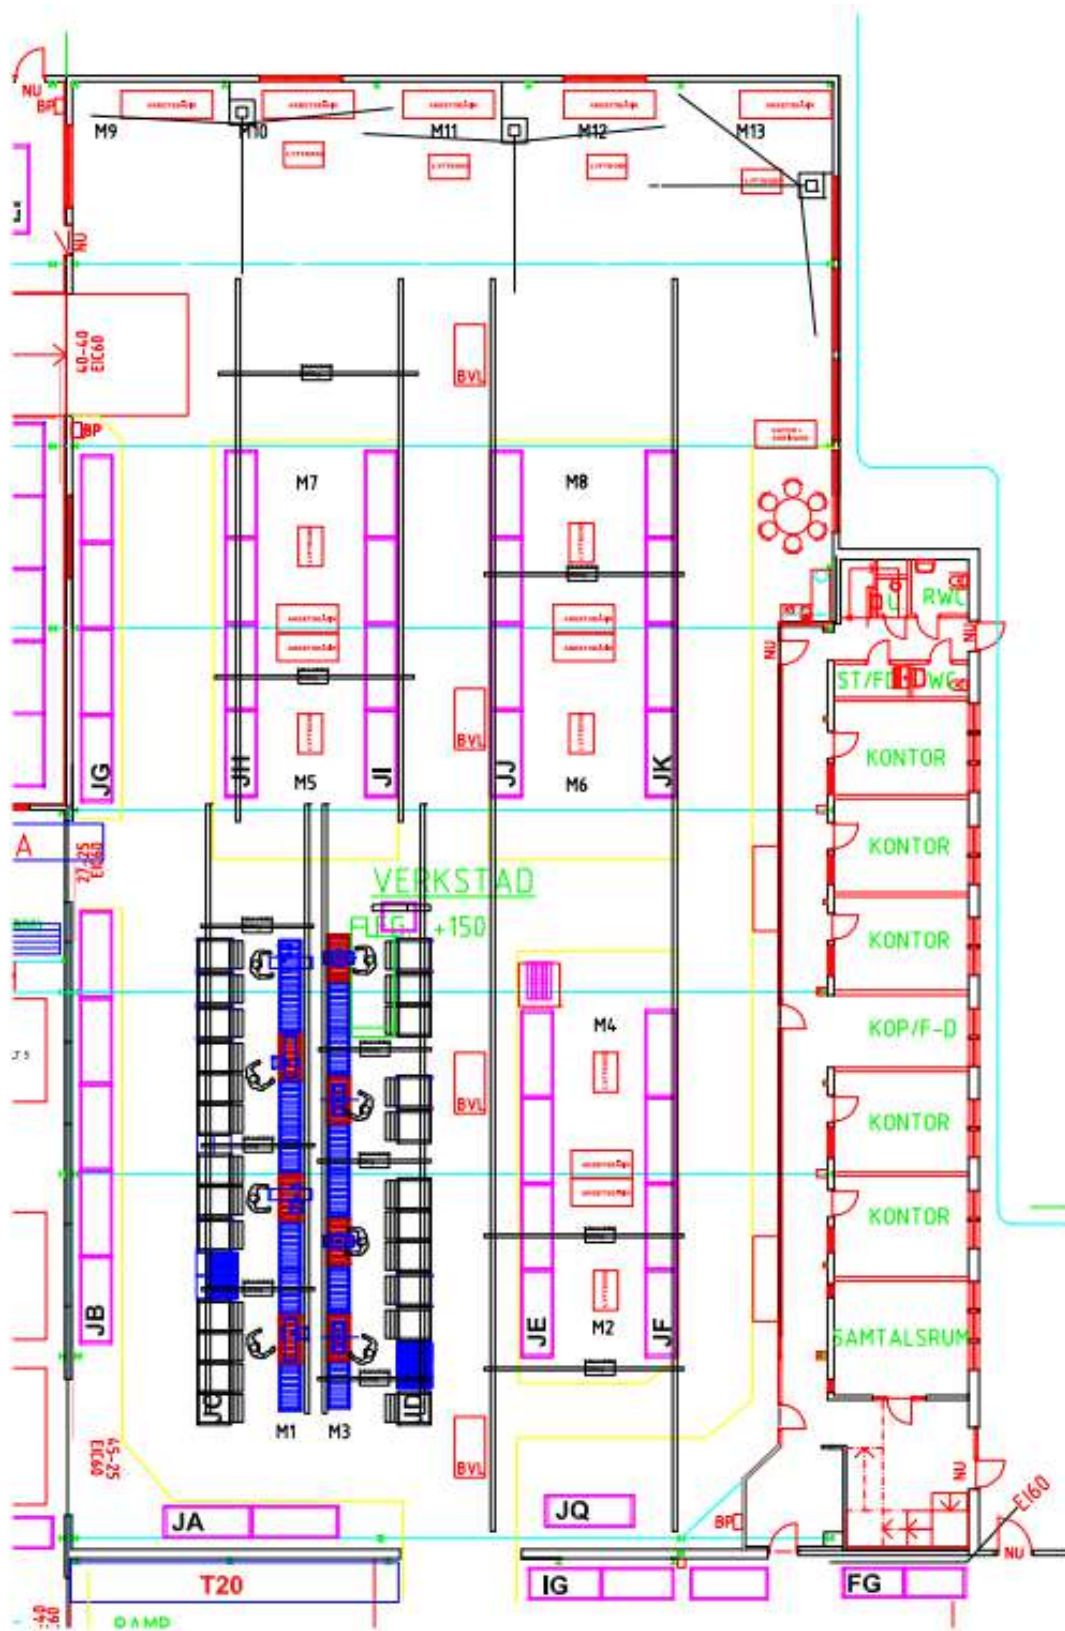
Drawing of Skandia Elevators Assembly Department. [Own picture].
